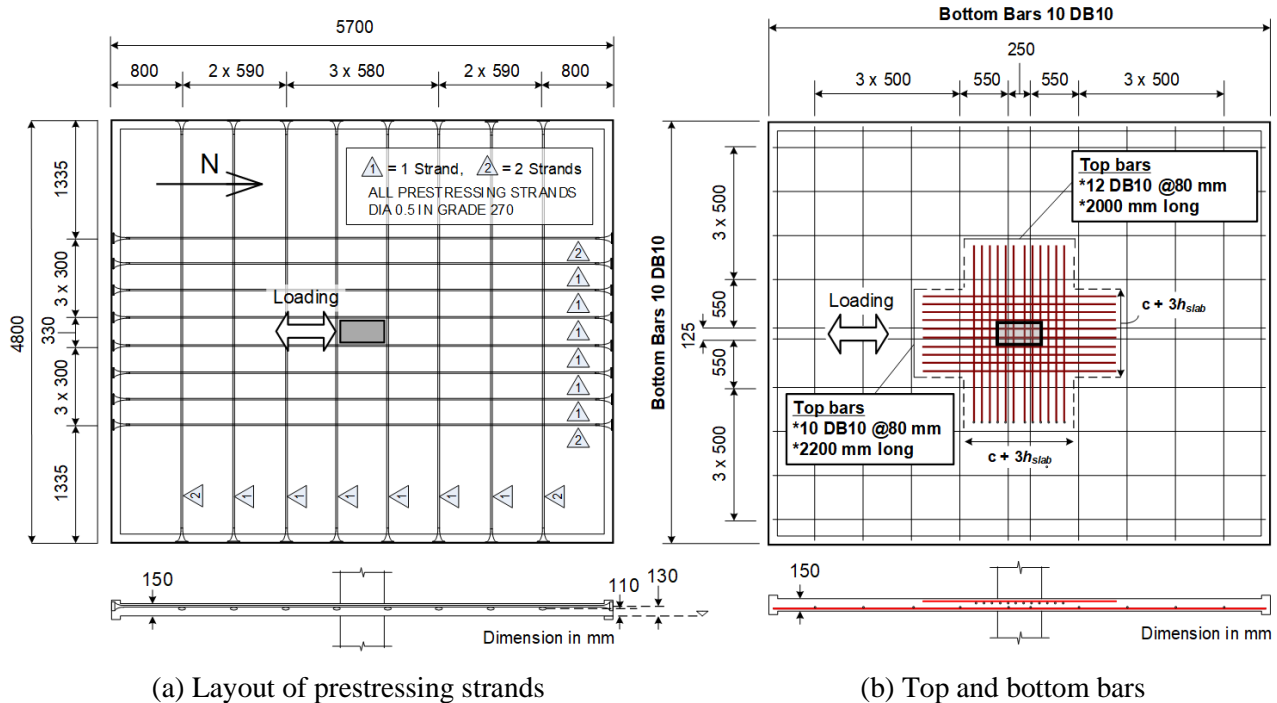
Layout of prestressing strands, and supplementary reinforcements in slabs of both specimens
